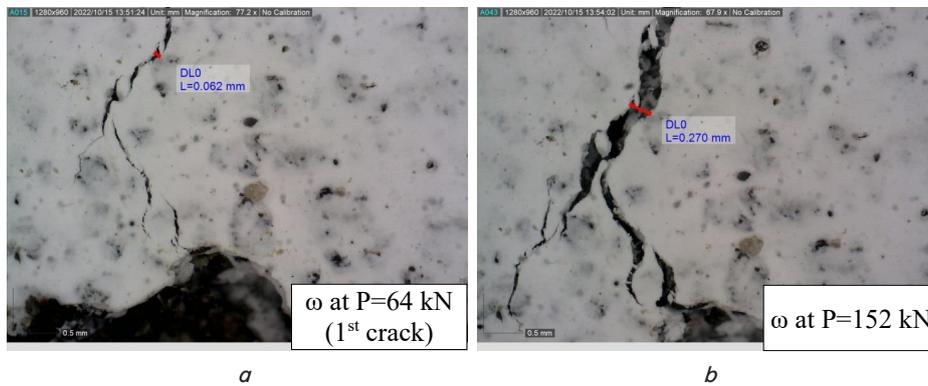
Crack width for specimens f_c' 15 MPa: a – initial crack; b – final crack
